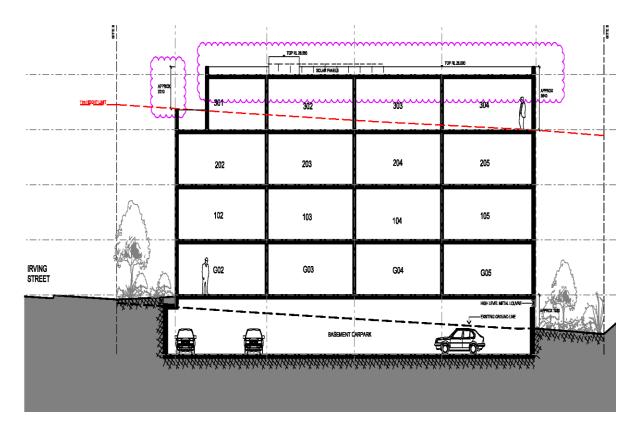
Extract of Section 3 showing exceedance in building height. (Amended Plans)
